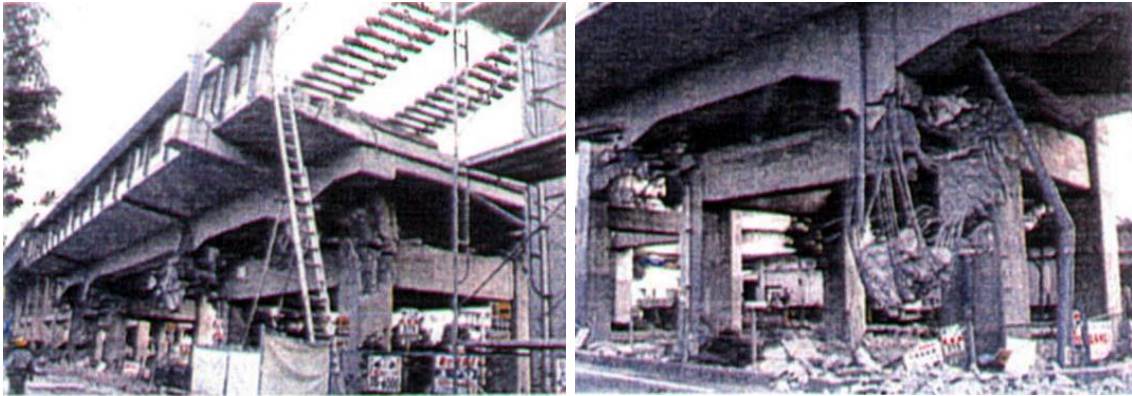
Shear failure of beam-column joints and columns.
